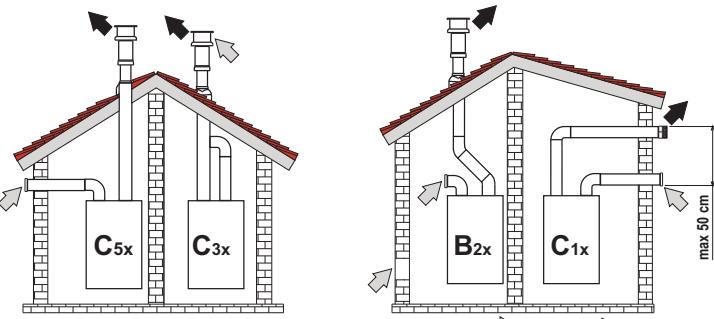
Examples of connection with separate pipes (➡ = Air / ➡ = Fumes)
